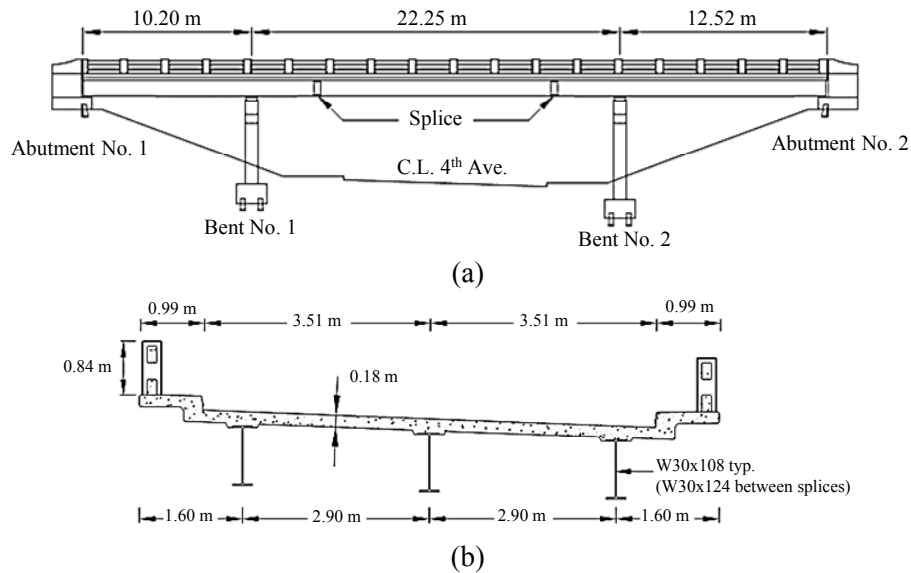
Entrance ramp to James White Parkway from I-40 westbound (a) Longitudinal profile (b) Cross-section (modified from Ragland 2009)
